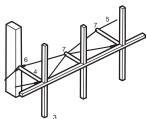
Truss system diagram using a horizontal cable truss as the primary structure.
